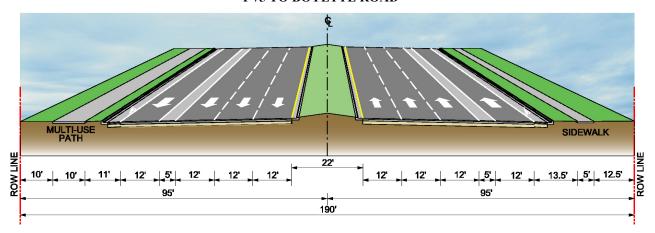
SIX-LANE DIVIDED URBAN TYPICAL SECTION BOYETTE ROAD TO FUTURE MCKENDREE ROAD REALIGNMENT
